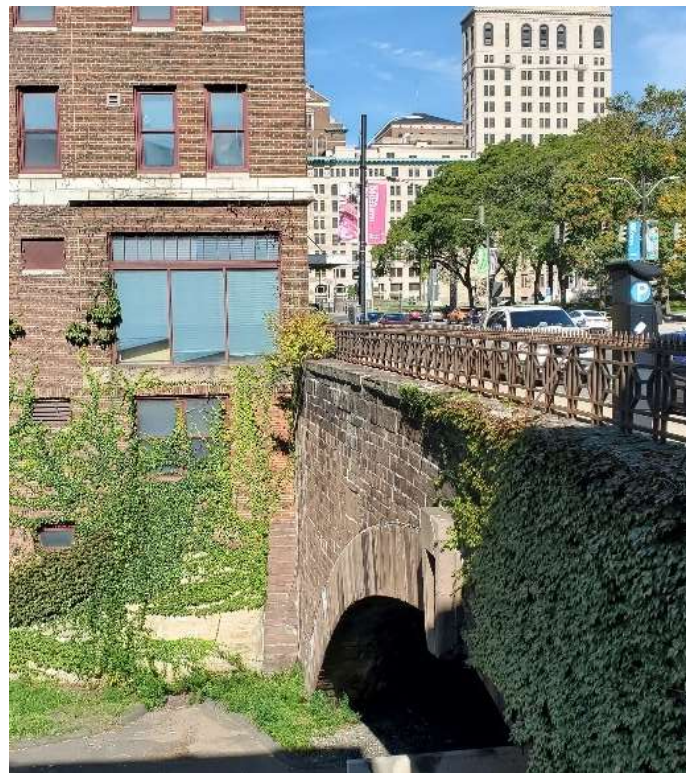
Same view in 2021 showing how corner of building sits on the bridge and road retaining wall.
